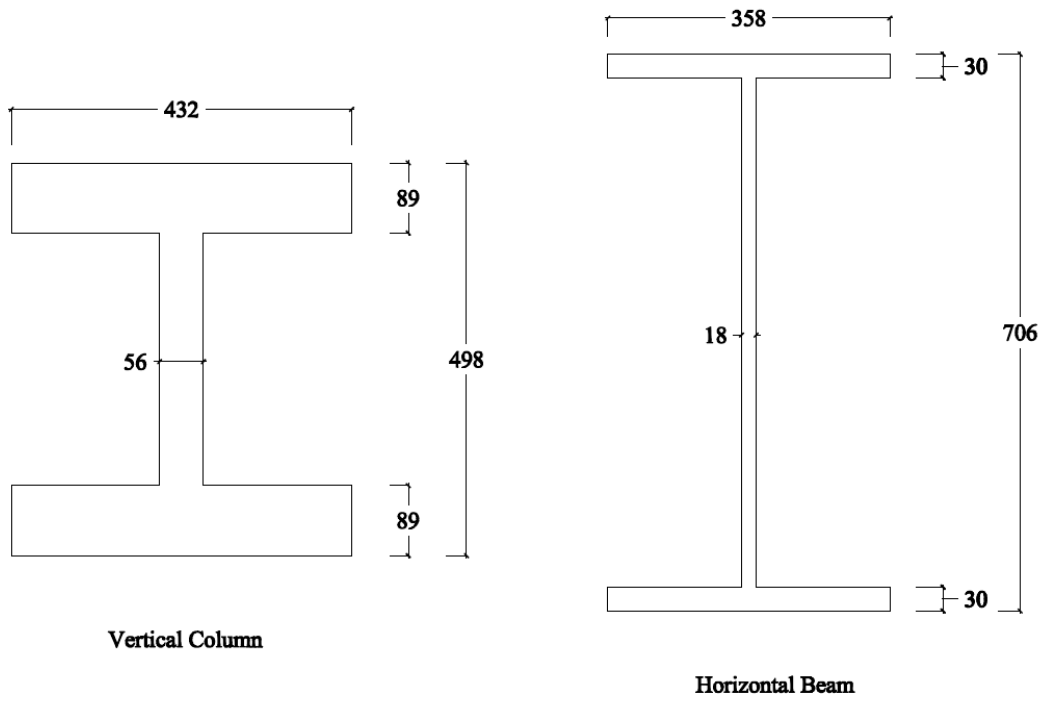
3: Cross section of Horizontal beam and Vertical column fixed for parametric study (all dimensions are in mm).
